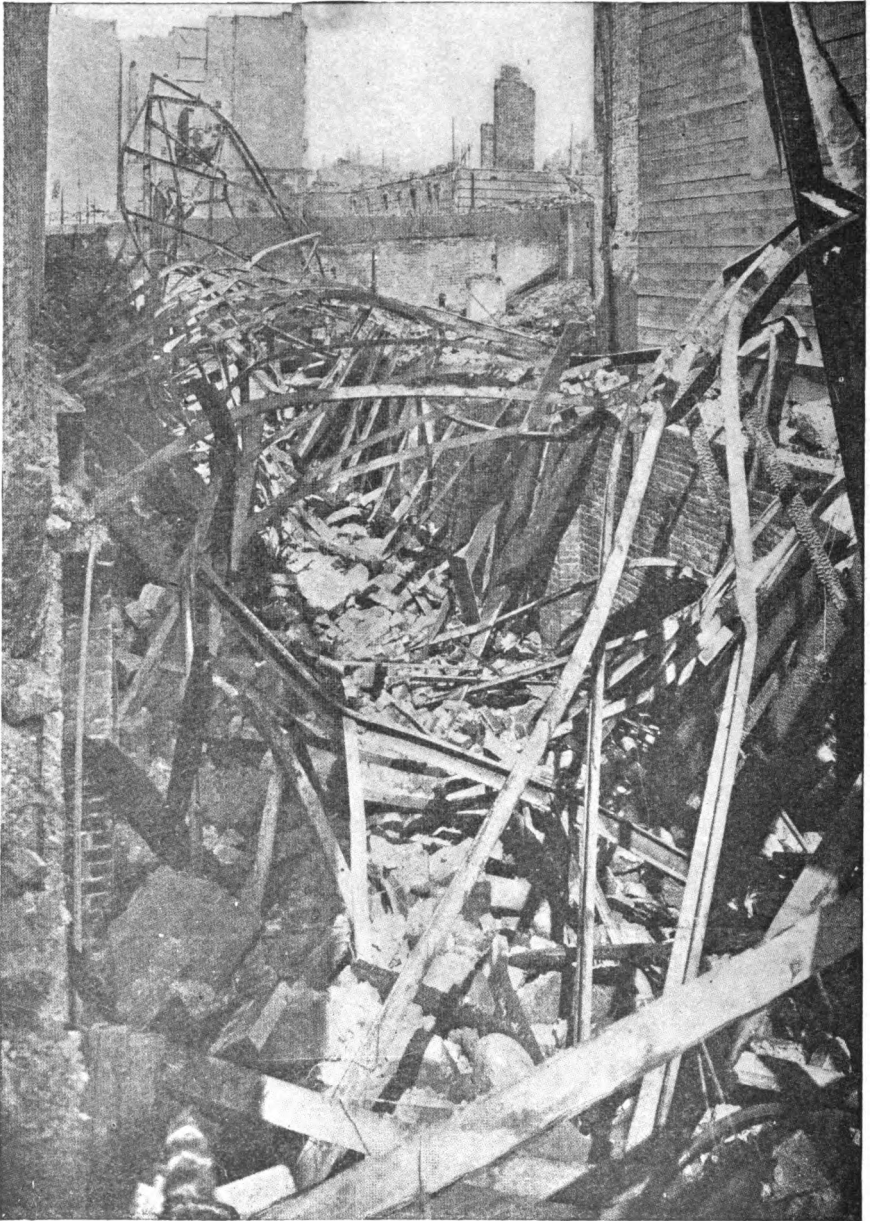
What was Left of One of San Francisco's Reinforced Concrete Buildings After the Fire
